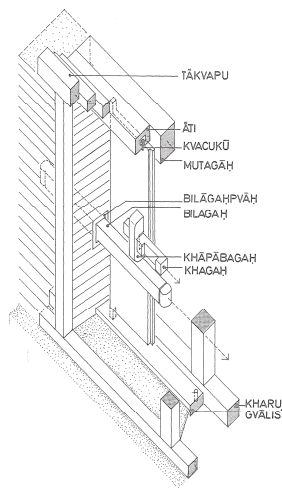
Section of a door: details of sill, lintel, door leaves and bolts (after Gutschow, 1987)².
